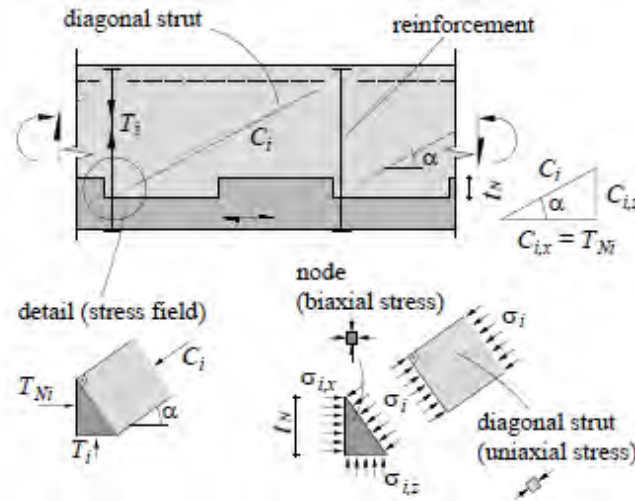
Strut-tie model by Boccadoro for the prediction of Concrete Compression Failure (CCF) in the notch for traditional TCC floors with a 'thick' cracked concrete slab [4].
